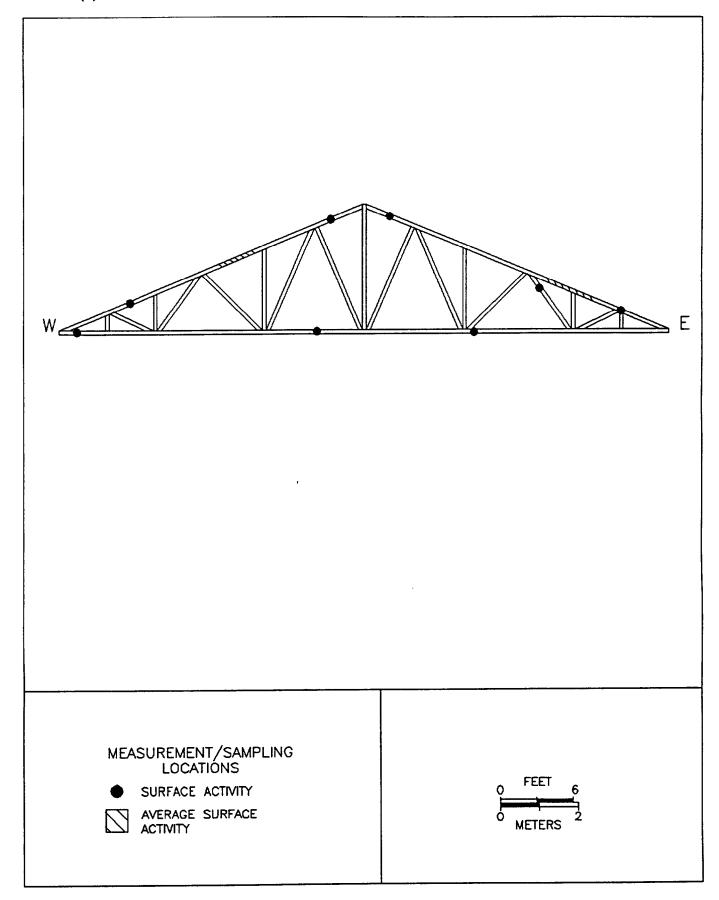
Building 3, Truss 7 — Measurement and Sampling Locations
